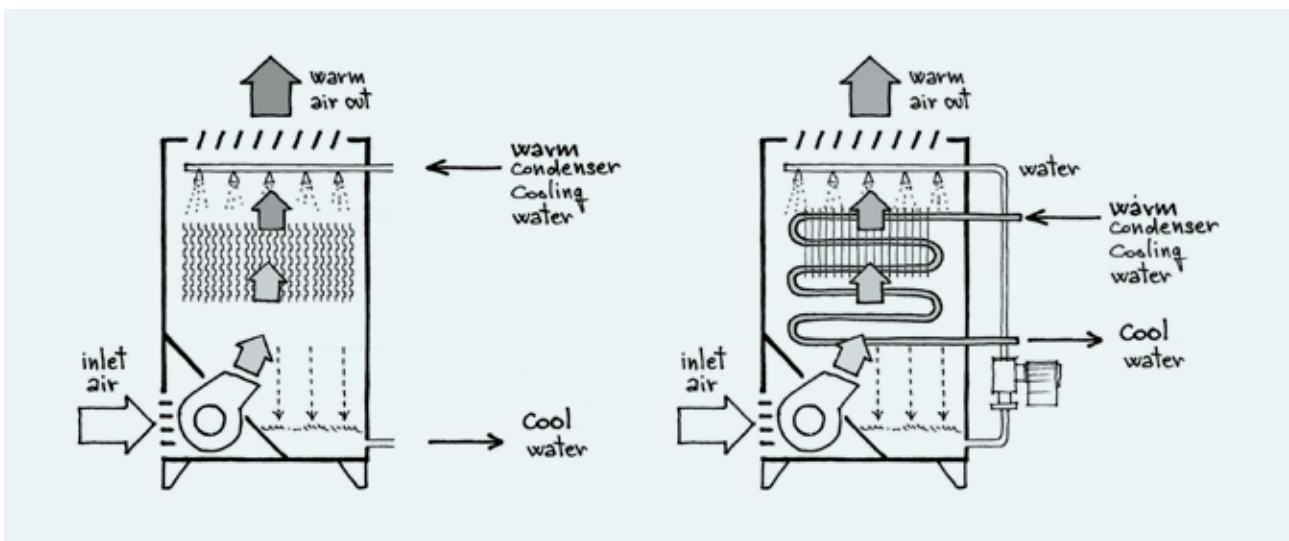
OPEN COOLING TOWER (LEFT); CLOSED COOLING TOWER (RIGHT)
